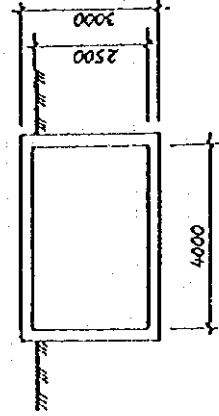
Compost yard and Urine Tank Construction Plan
